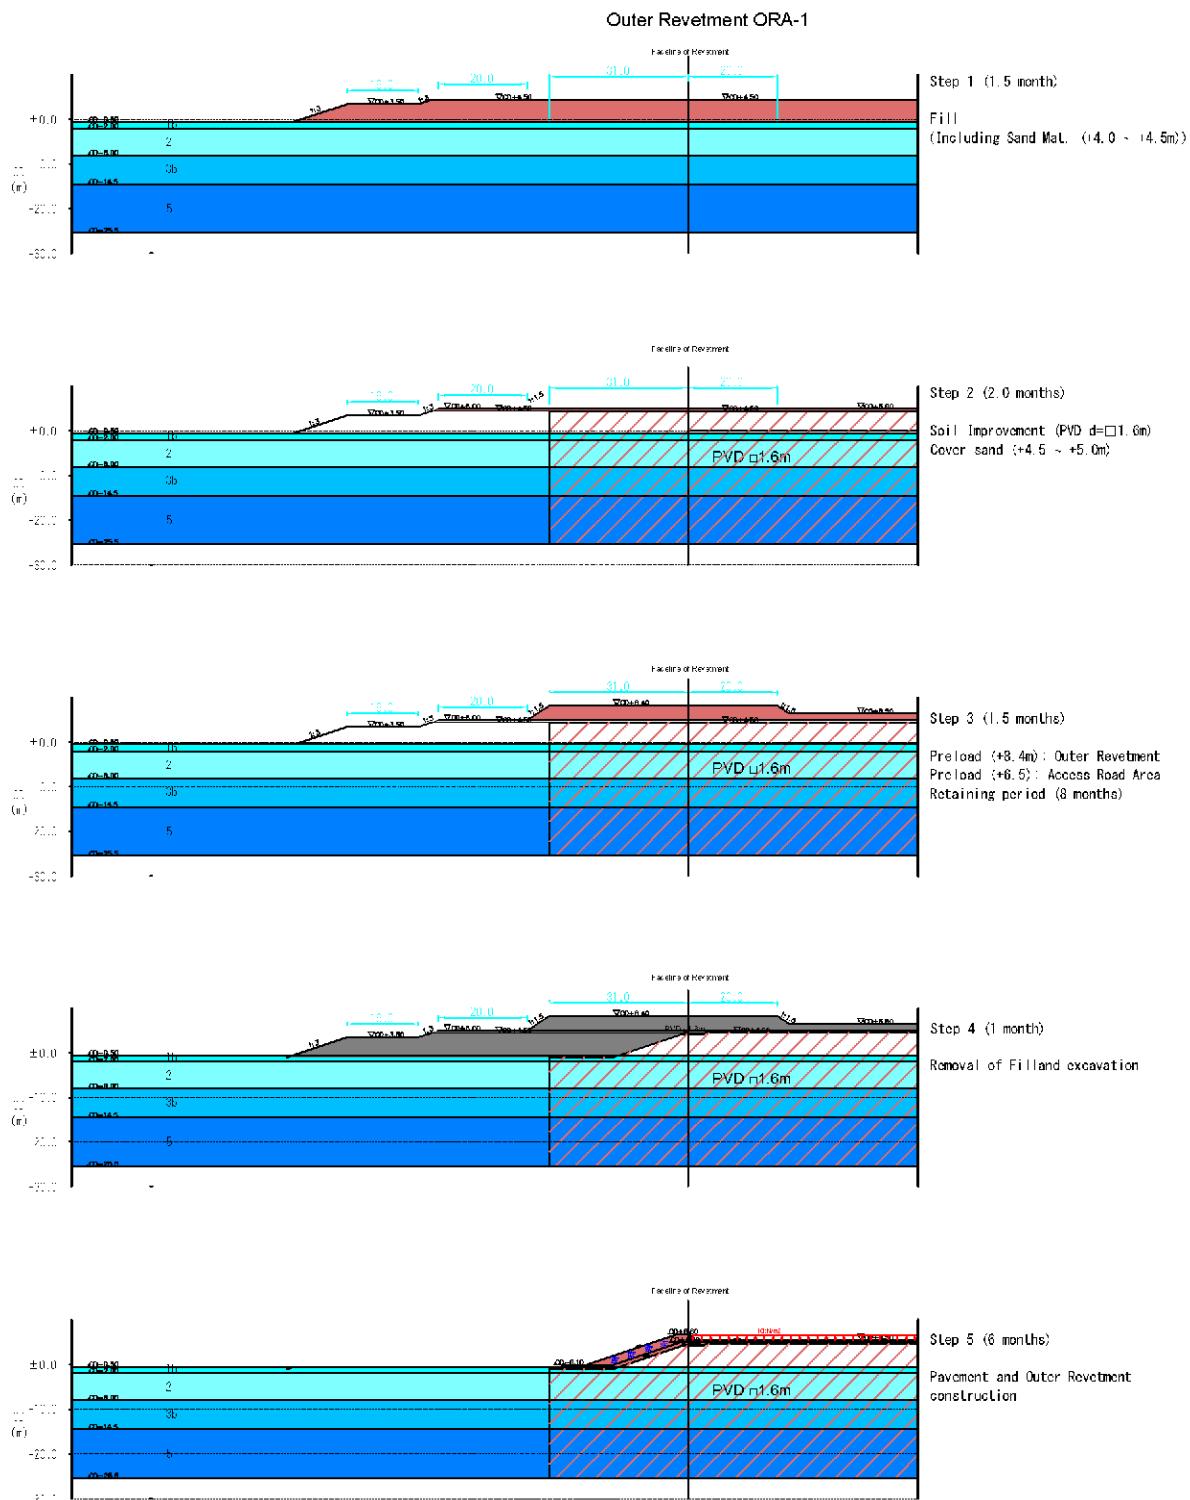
Subsoil Improvement Procedure with PVD+Preload at Section ORA-1 (Outer Revetment A)
